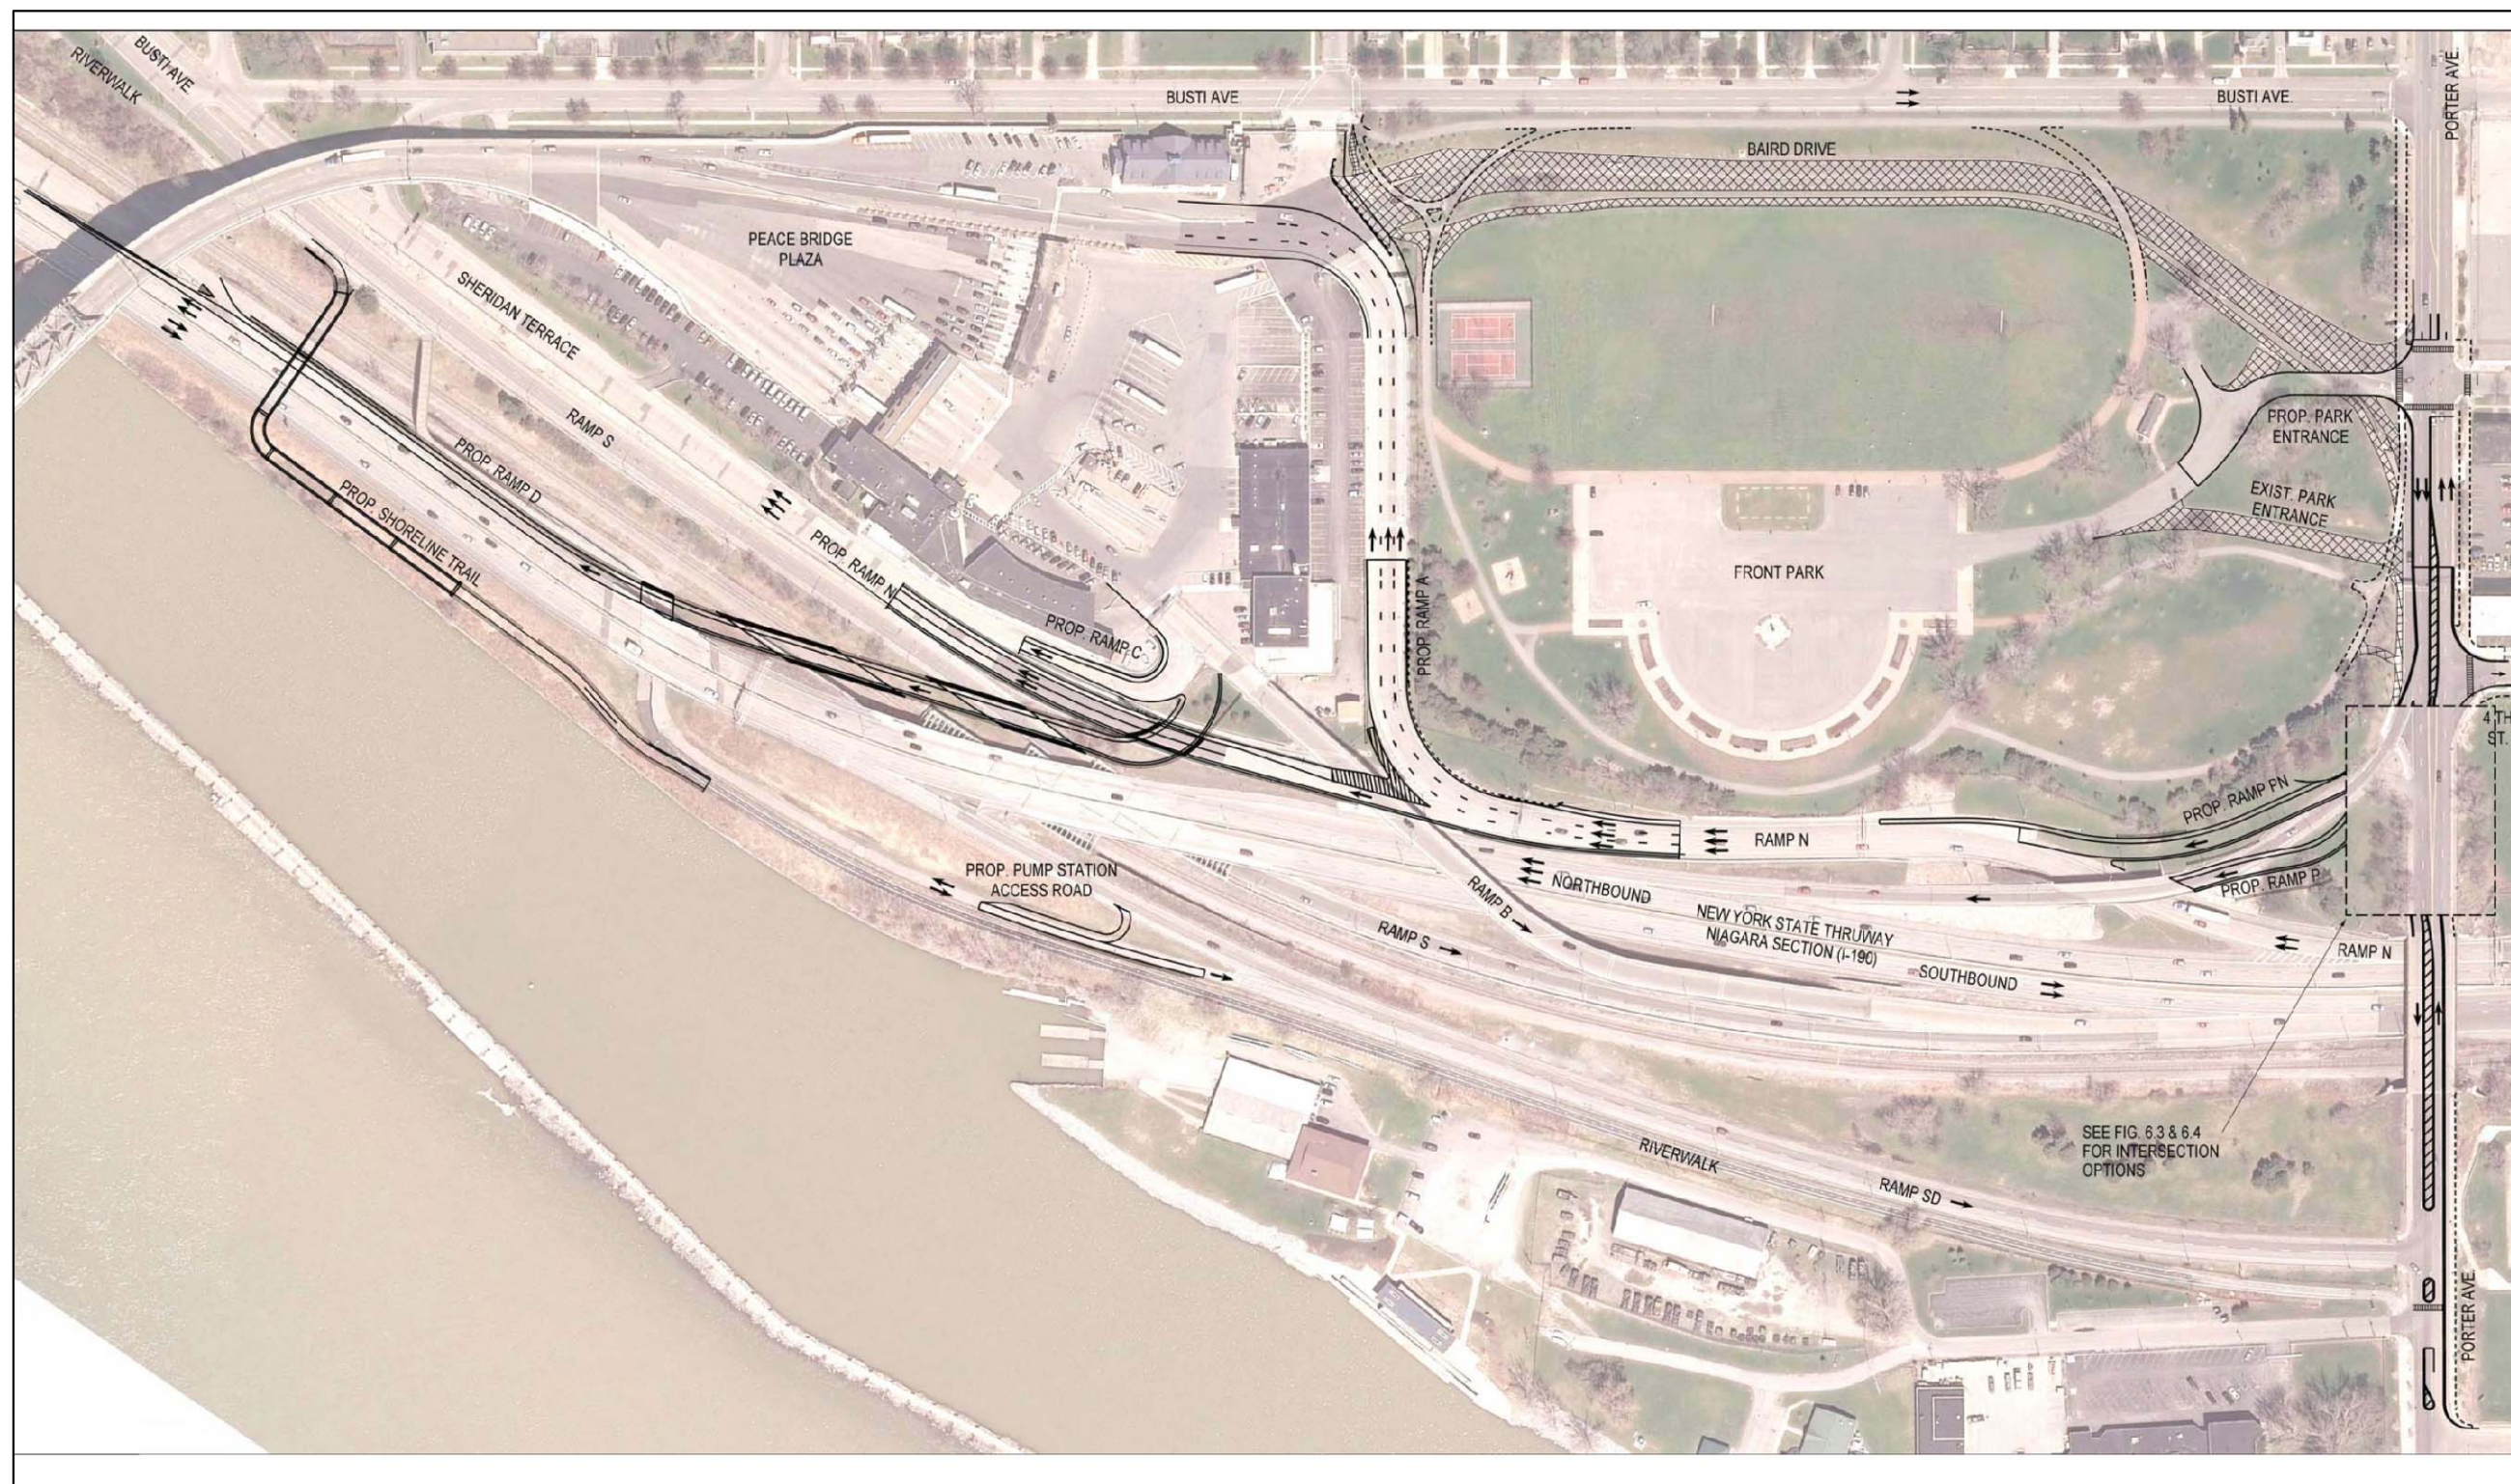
Proposed Shoreline Trail and Massachusetts Pumping Station Modifications
